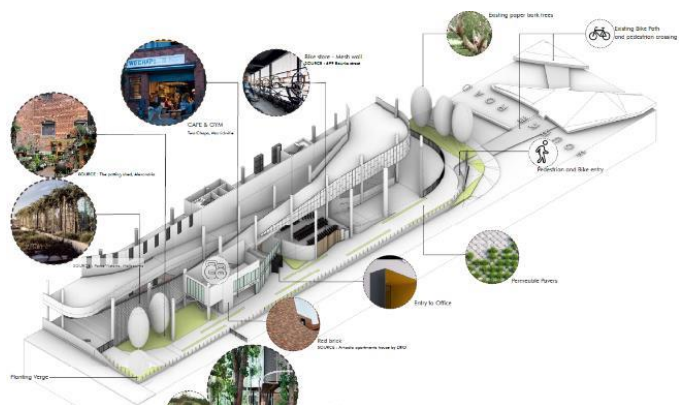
Precedent image, 520 Gardeners Road, Alexandria (Charter Hall)
